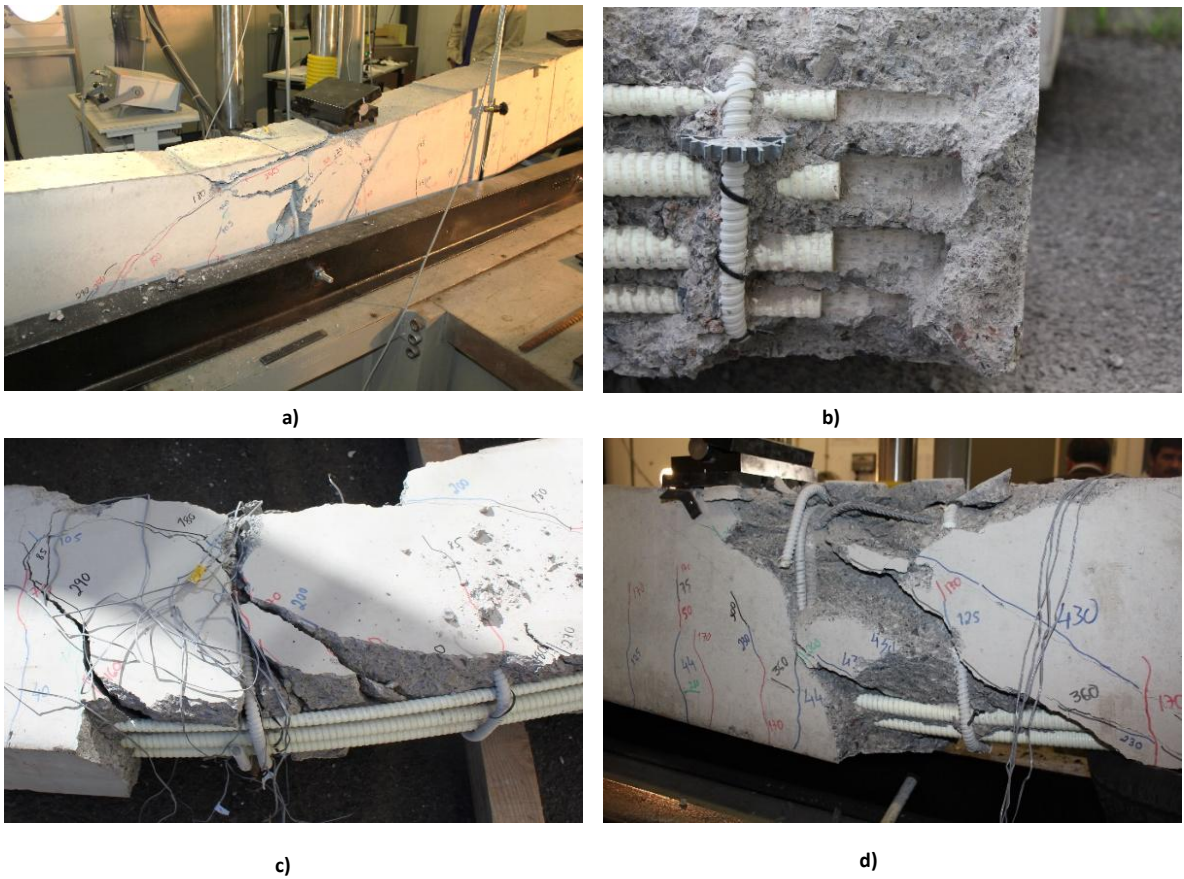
Failure of test specimens: a) BS250GFRP1; b) slip of the longitudinal reinforcement in BS250GFRP1; c) stirrups after failure in BS250GFRP1; d) BS250GFRP2
